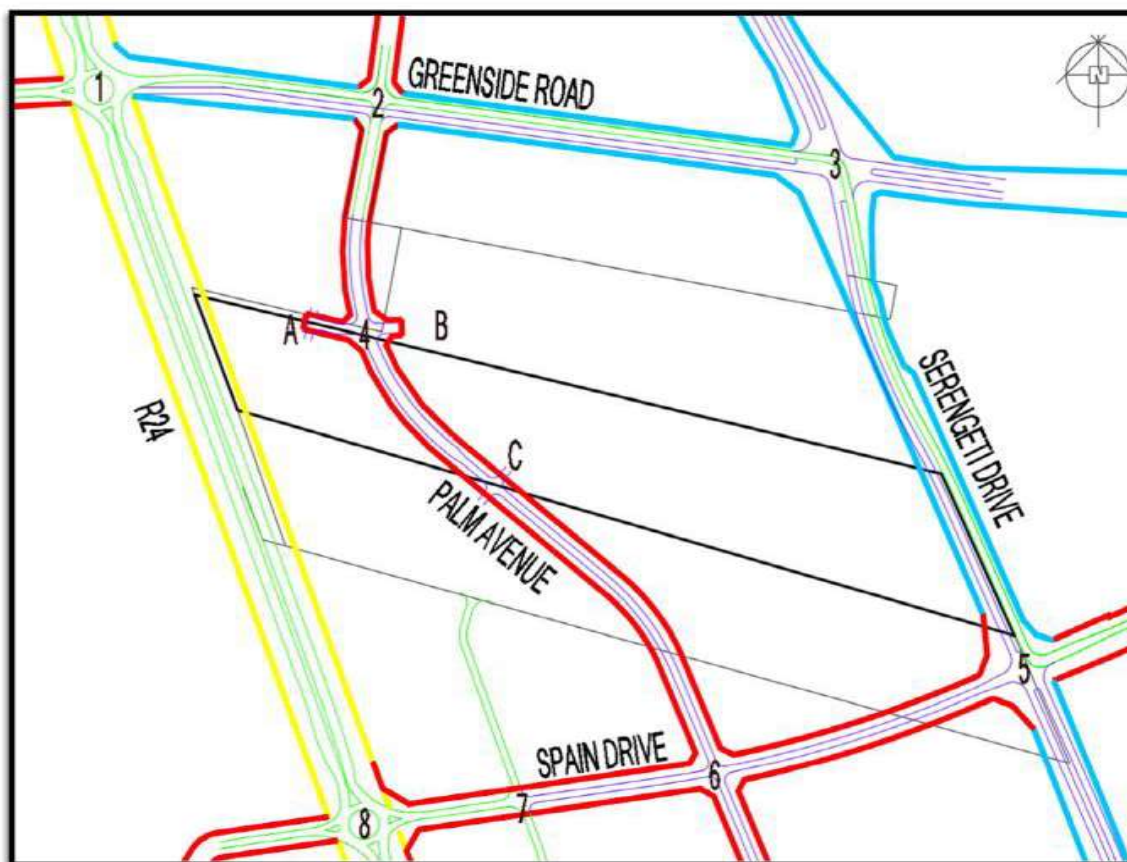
Primary Roads in the Study Area, showing the planned SANRAI Road Palm Avenue.
